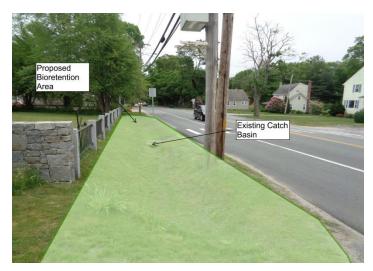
View of proposed bioretention area to be located on Kingstown Road, in front of the Courhouse Center for the Arts in South Kingstown, RI.
